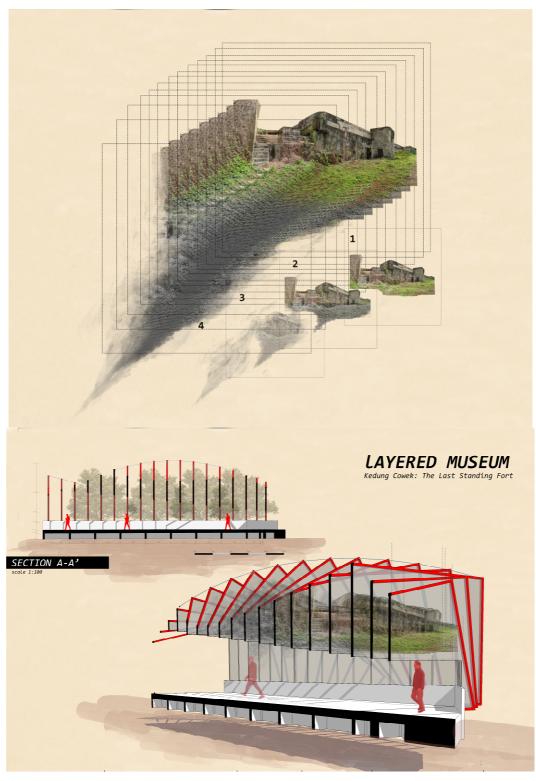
Layered Museum Section (source : *author's illustration*)
